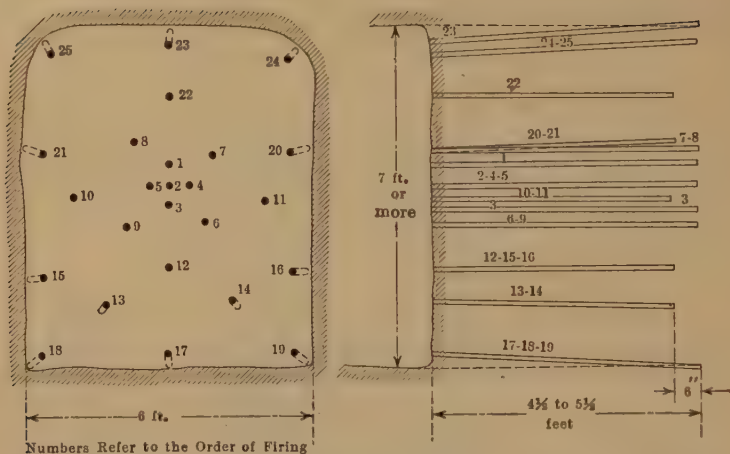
ARRANGEMENT OF HOLES FOR DRIFTING—ROUND OF 25 HOLES.
